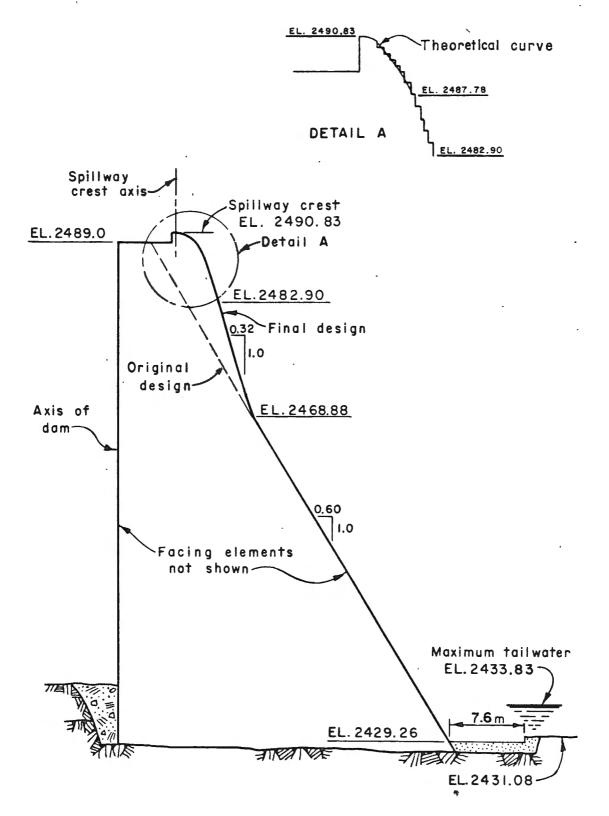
Final design - Upper Stillwater Dam section. (Elevations in meters)
